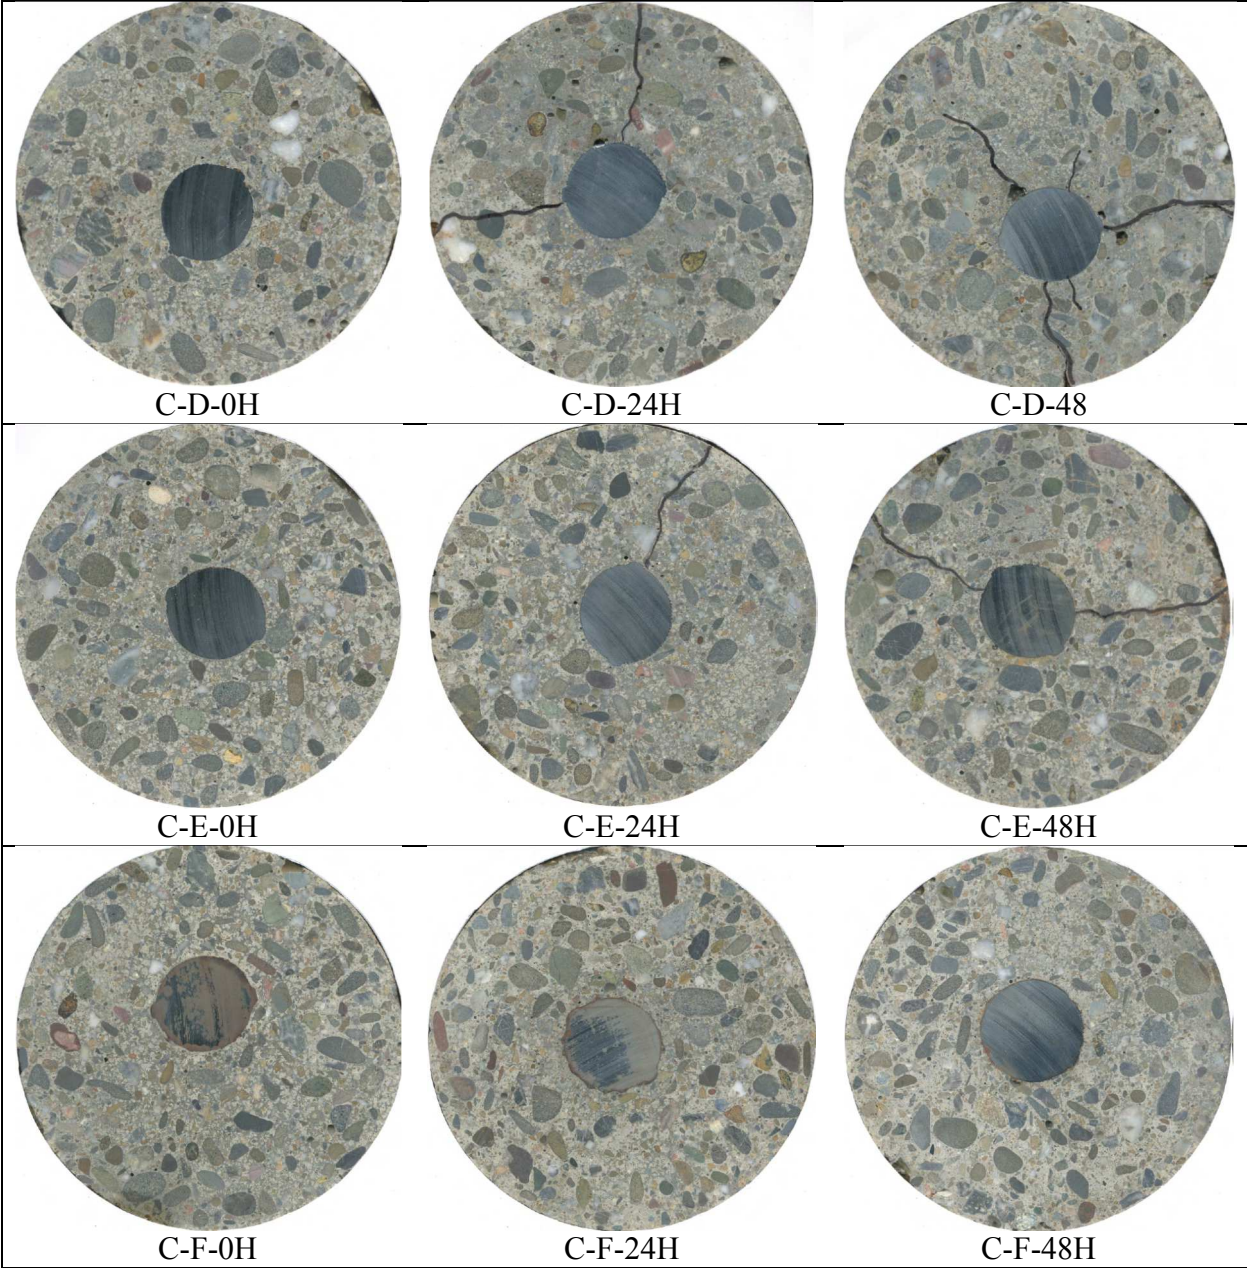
Corrosion on bar surfaces showing patches of corrosion on C-D-0H/C-E-0H and uniform corrosion for all other samples
